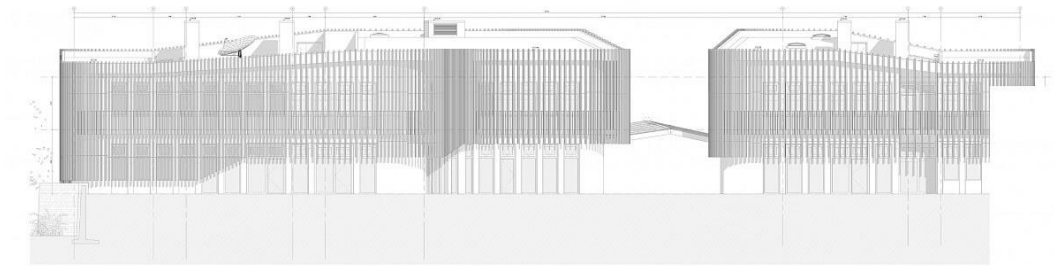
West elevation of French embassy showing sloped roof (Terreneuve, 2022)
